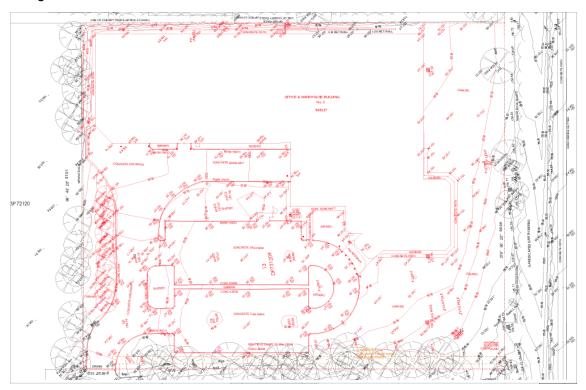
Proposed demolition at No. 3 Skyline Place (Source: PA Studio)
